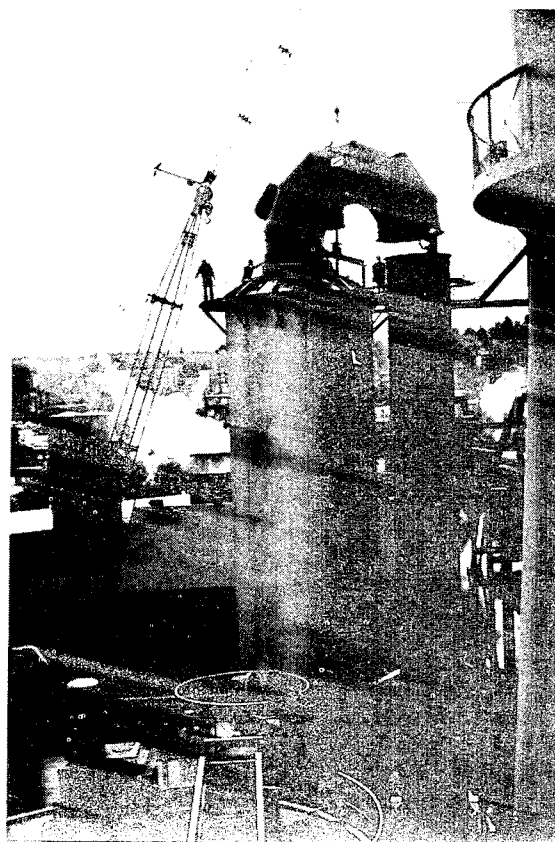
C102 Bleach Tower - Installation of Inlet Elbow.
